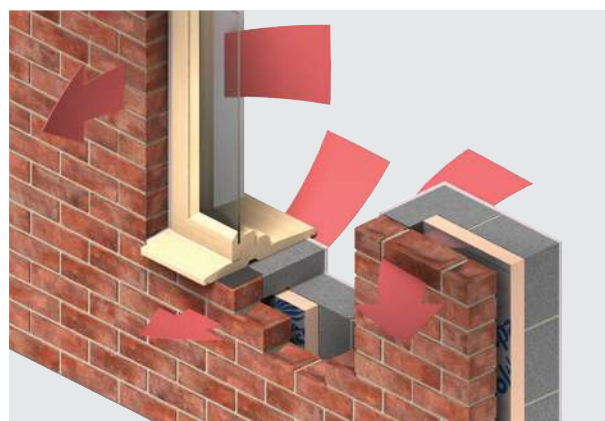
Heat Loss Paths Around a Typical Window Opening in a Masonry Cavity Wall Construction
